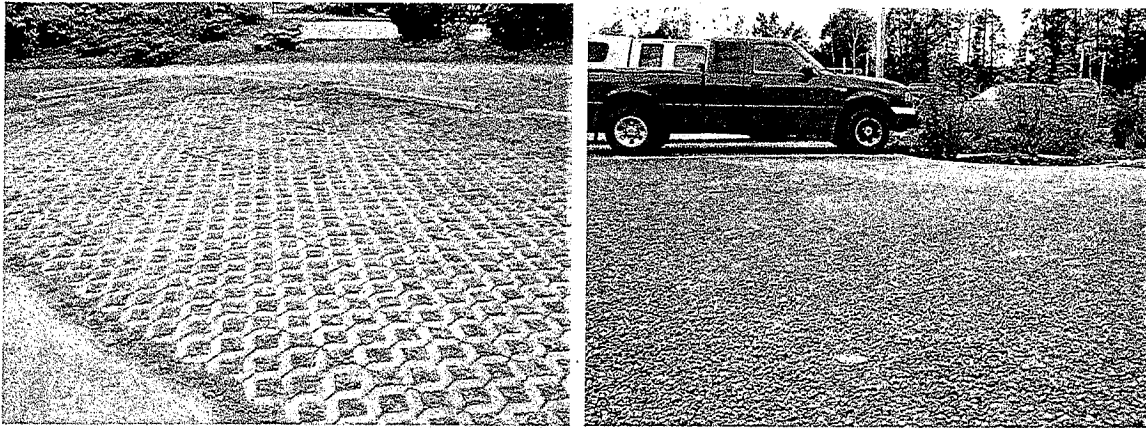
Two Types of Permeable Pavement: Interlocking Blocks (left) and Porous Asphalt (right).
